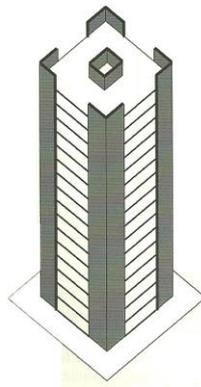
Shear Wall System (Source: Günel and Ilgın, 2010)
